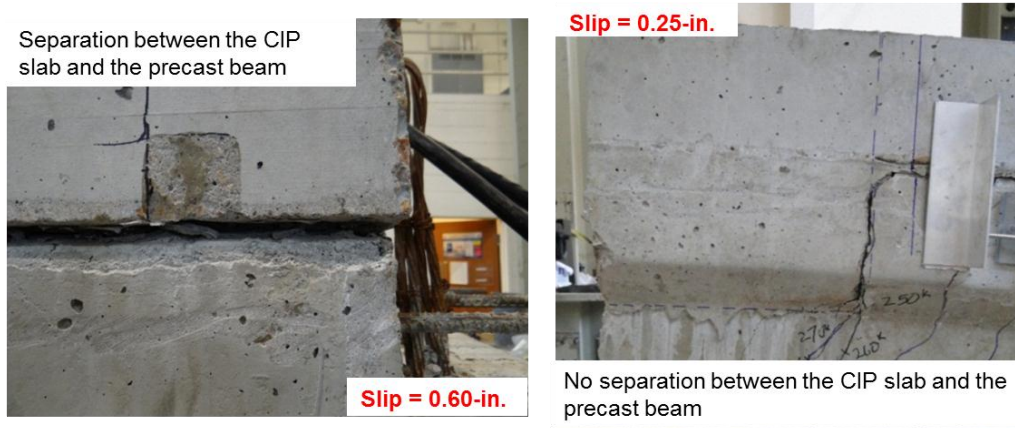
Box beam (a) without blockout and (b) with blockout slip at failure
